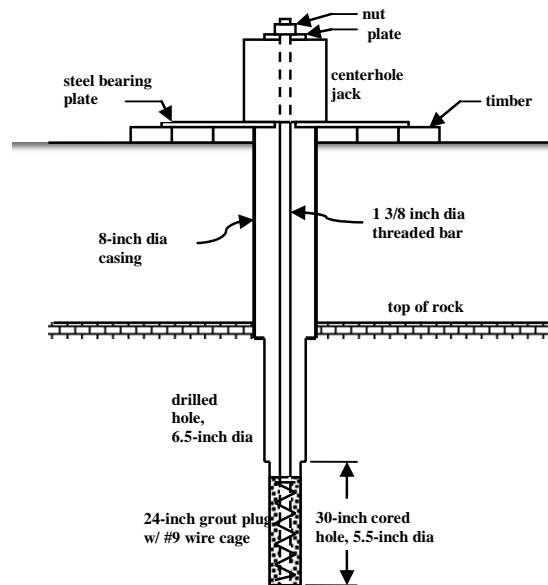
Small-scale Pullout Test Used in Florida Limestone (after Crapps, 1986)
